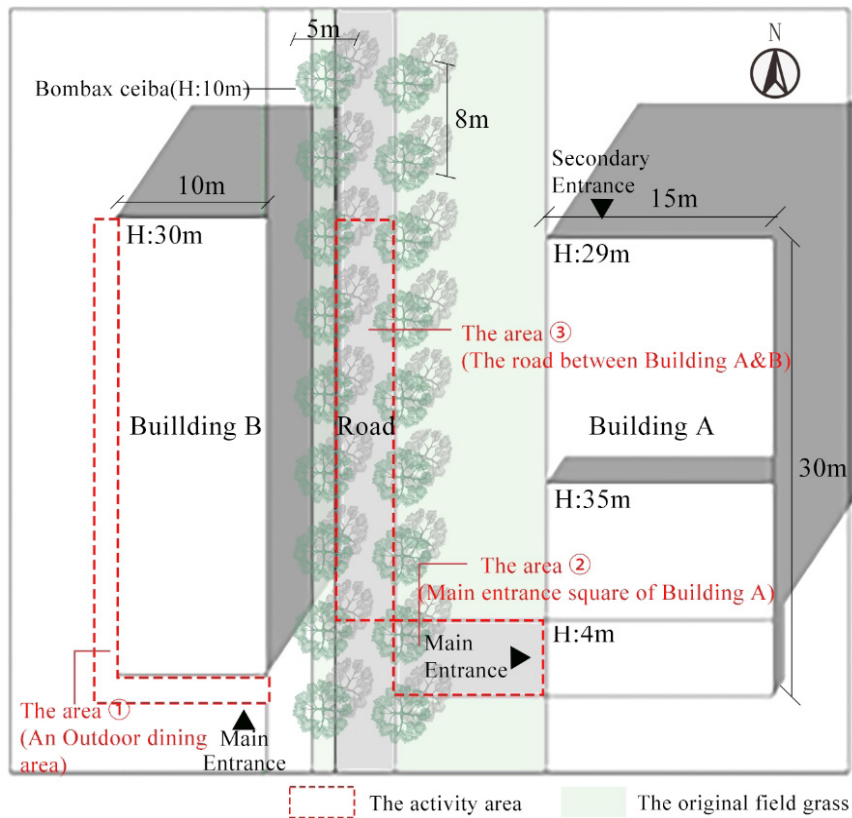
The site plan of building A and B in the teaching area of a certain university in Guangzhou
